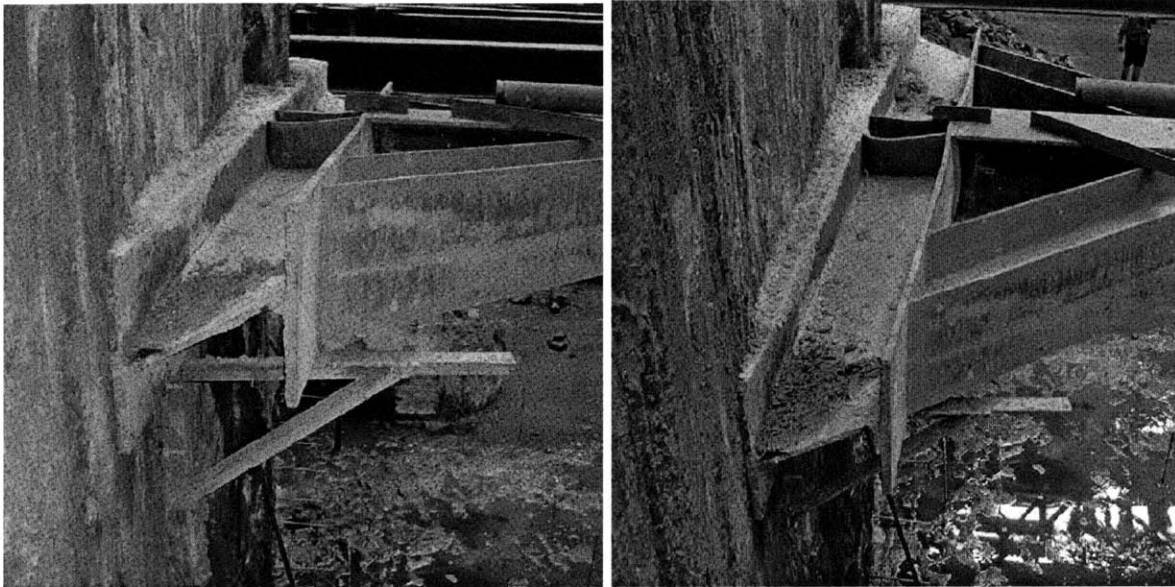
Stiffener Plate and Waler Beam Web Buckling (MOM, 2005)
